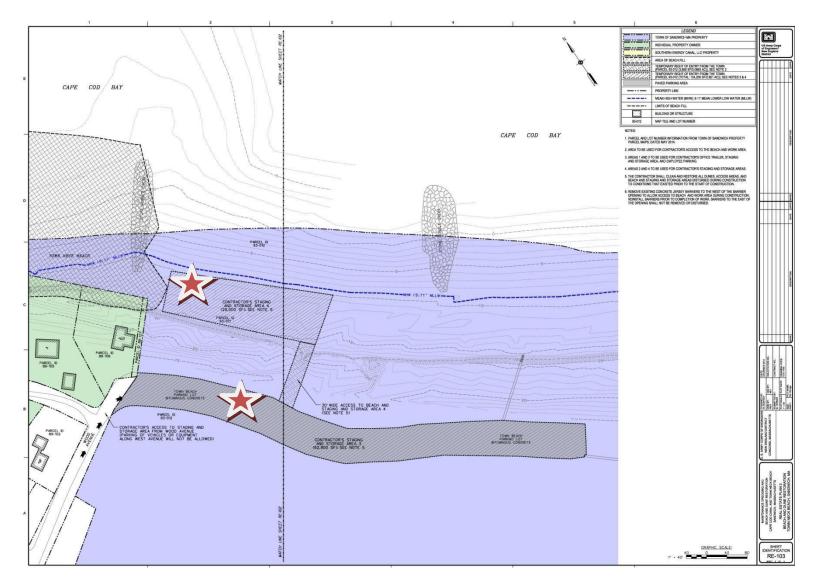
CCC Sandwich, MA Section 204 Beneficial Uses of Dredge Material Project Plan.
